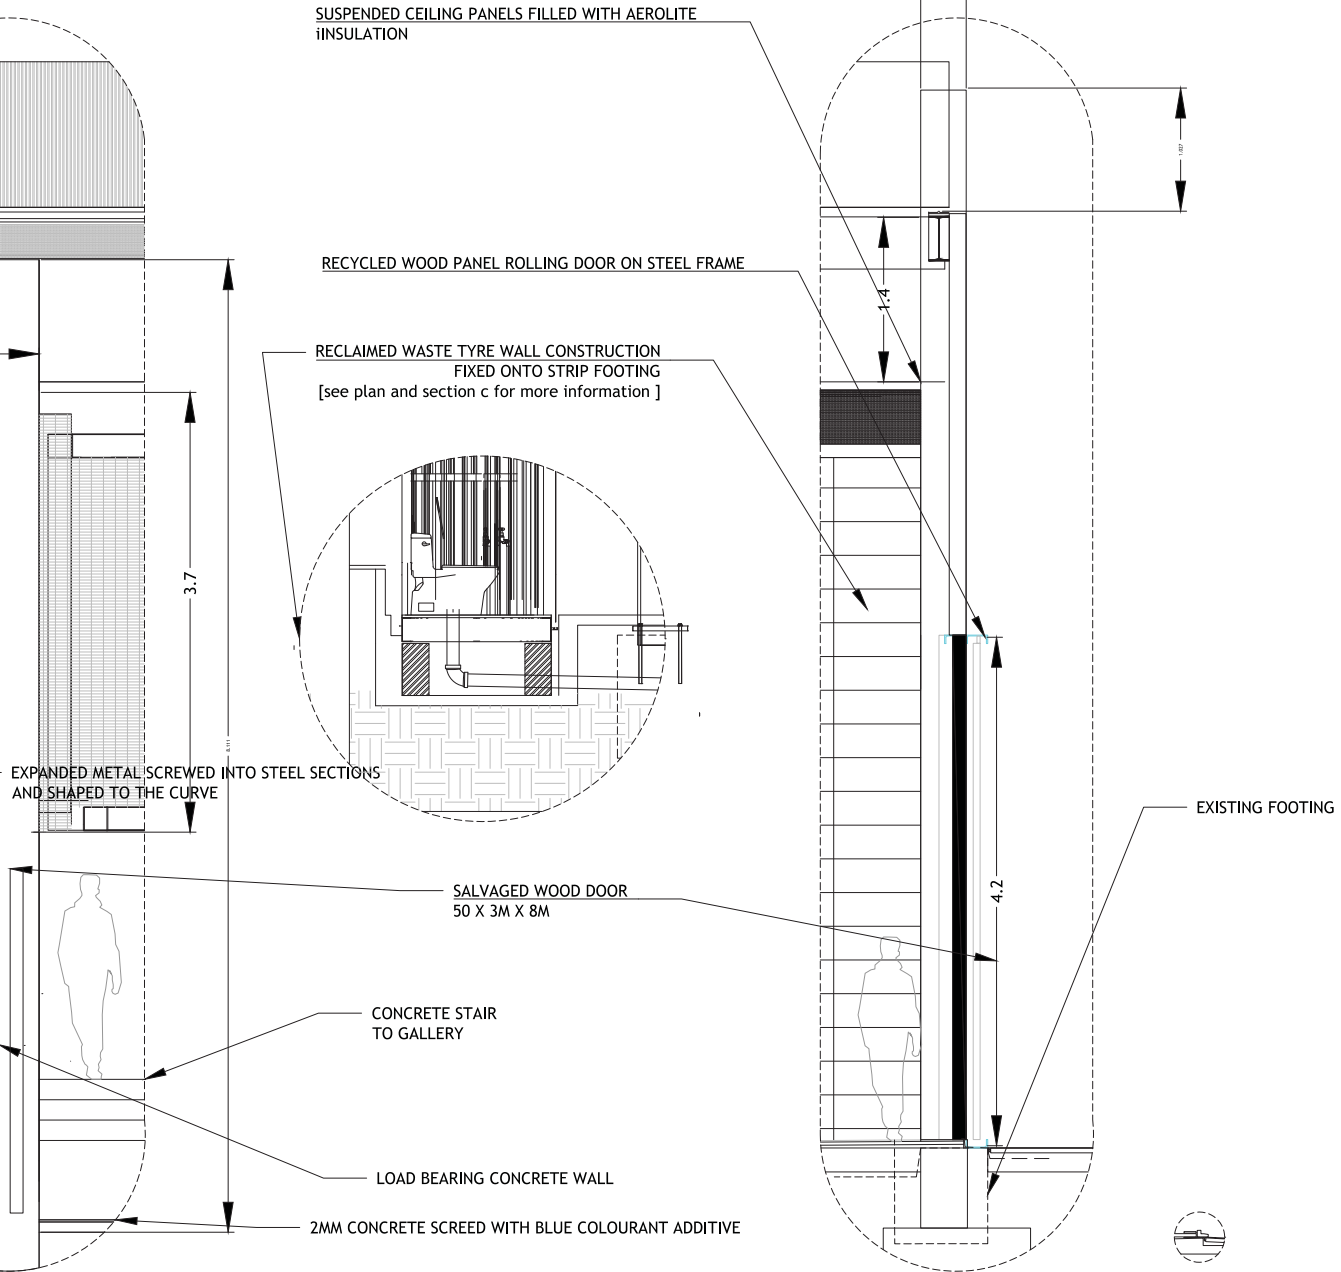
Sectional detail drawings of how conceptual value of waste become translated into the walls that divide the spaces and also support the gallery as it pierces through the structure existng,
